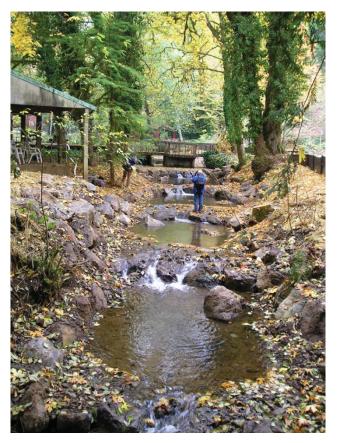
Example of boulder weirs used to raise a channel profile to support an existing bridge (Murtaugh Creek, OR)
